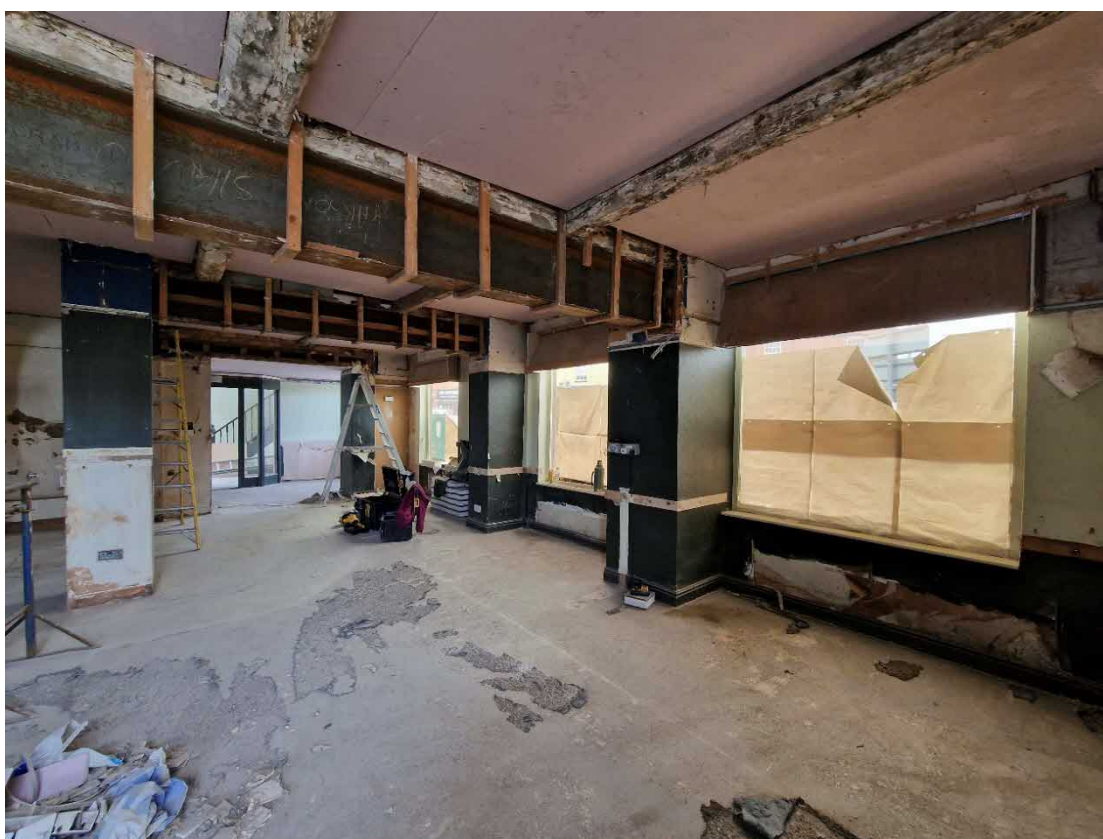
Internal view of the restaurant with RSJ girders and primary timber ceiling beams
